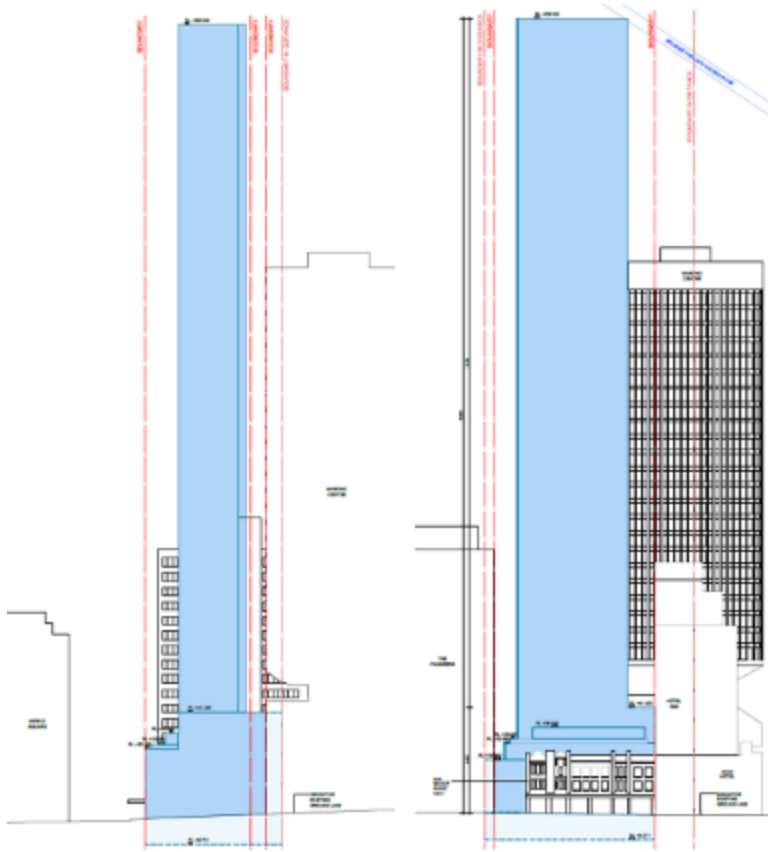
Proposed envelope plans - south (left) and west (right) elevations
